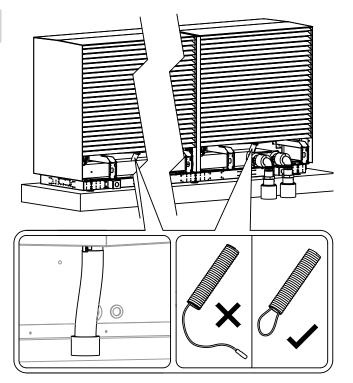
ADAPT MAX 10070-10140 - installation of condensate drain tube into the foundation drain pipe.
